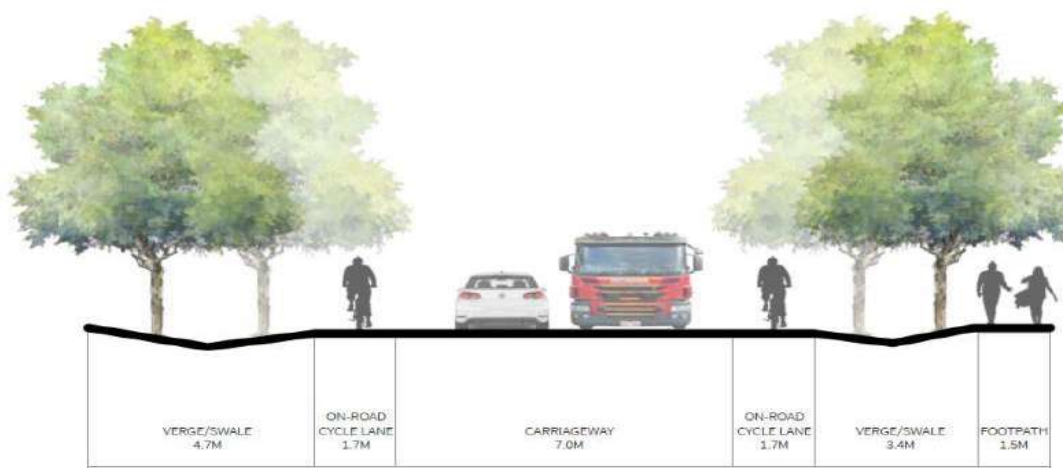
Potential Rural Arterial Road Cross Section (source: Kyneton South Framework Plan)
